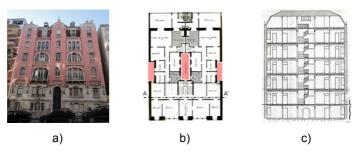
'Gaioleiro' building located on Duque de Loulé Avenue (Branco, 2007): a) Façade wall; b) Plan of a current floor; c) Cross section A-A'.
